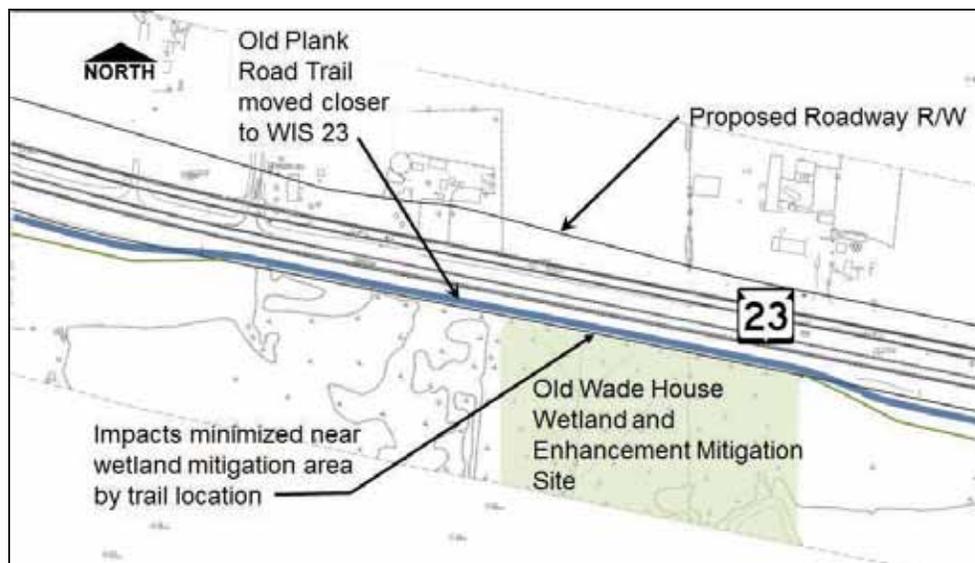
C-1.7 Old Plank Road Trail and Old Wade House Wetland Mitigation Site
